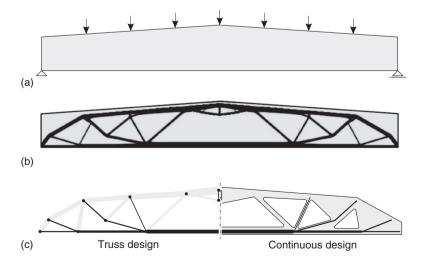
OAD of a roof girder: (a) static system and design space, (b) optimization result, (c) resulting truss structure and RC structure with free reinforcement layout.
